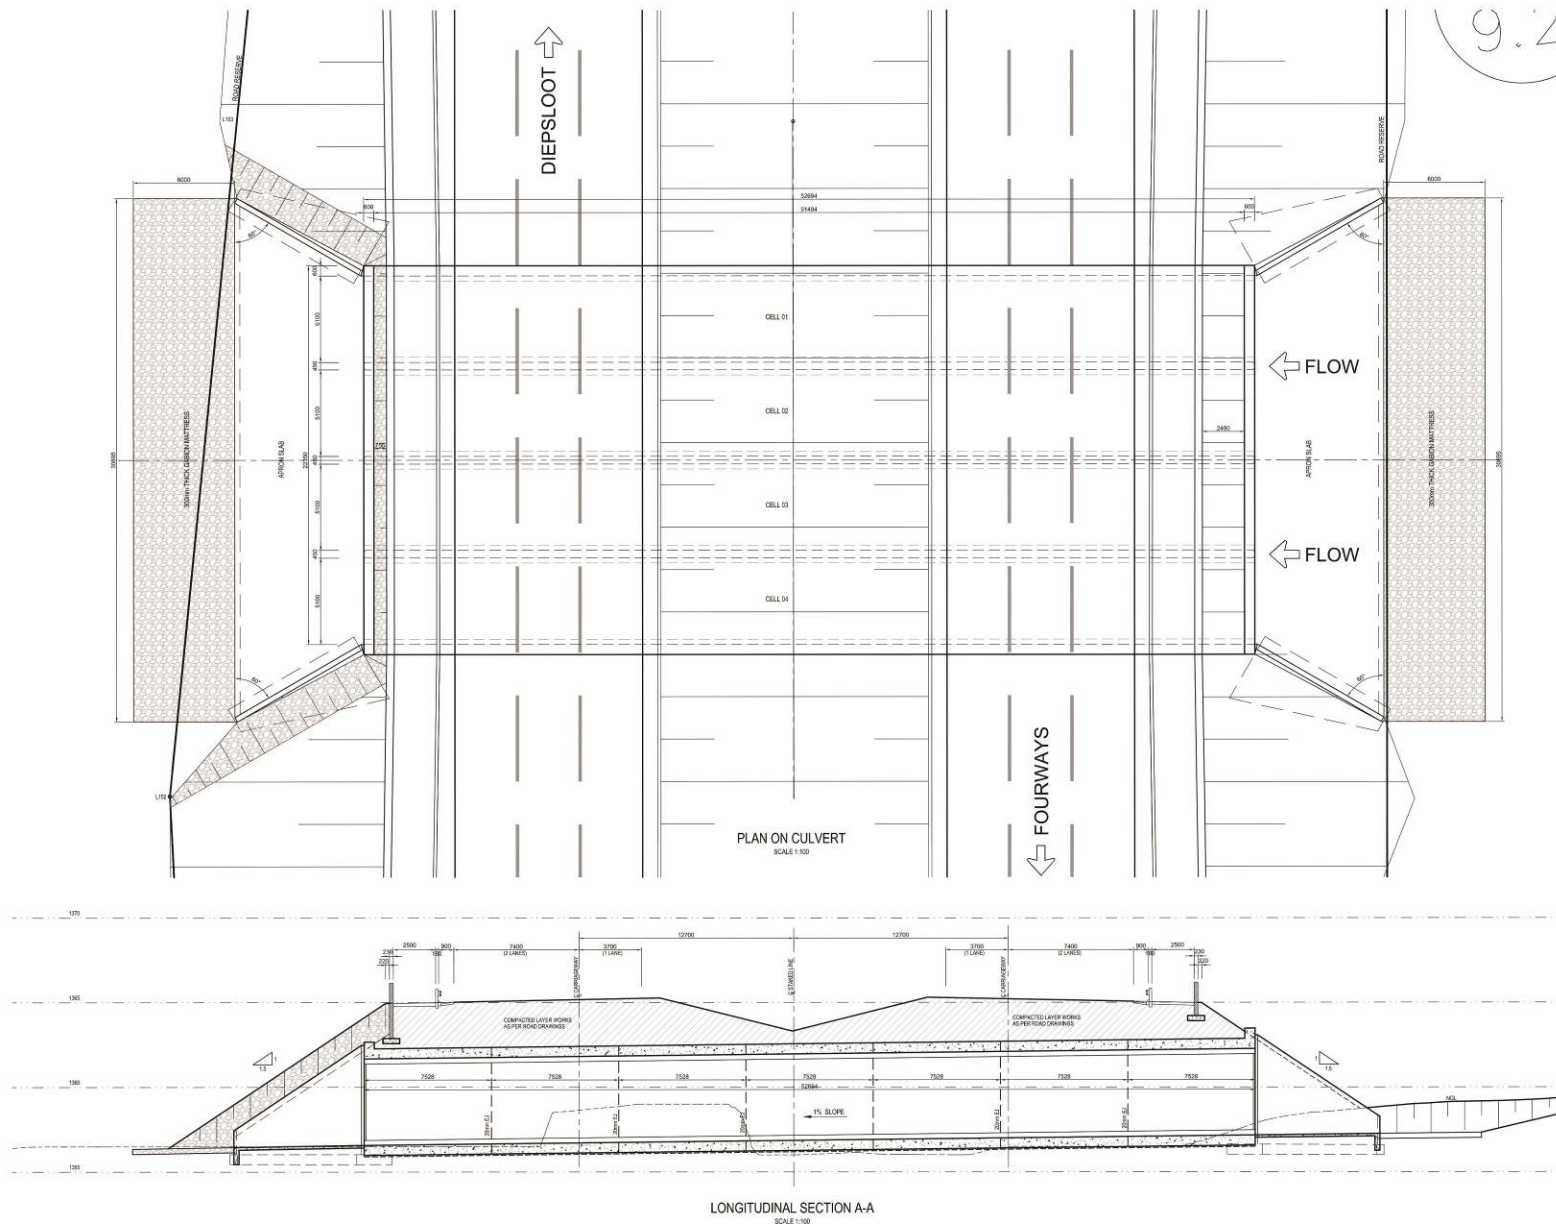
Reinforced concrete box culvert structure to be implemented at the wetland section
